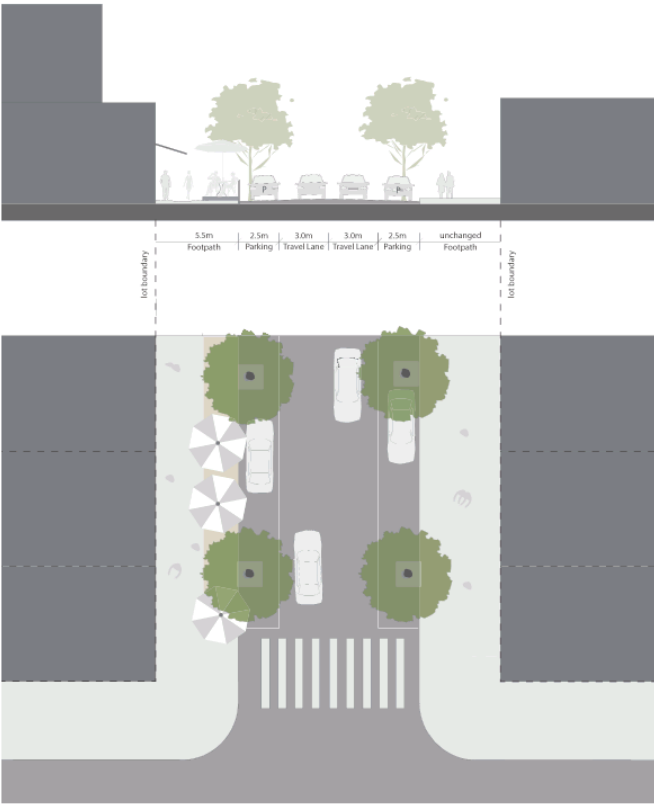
PROPOSED INDICATIVE FUTURE STREETScape - WALZ STREET
